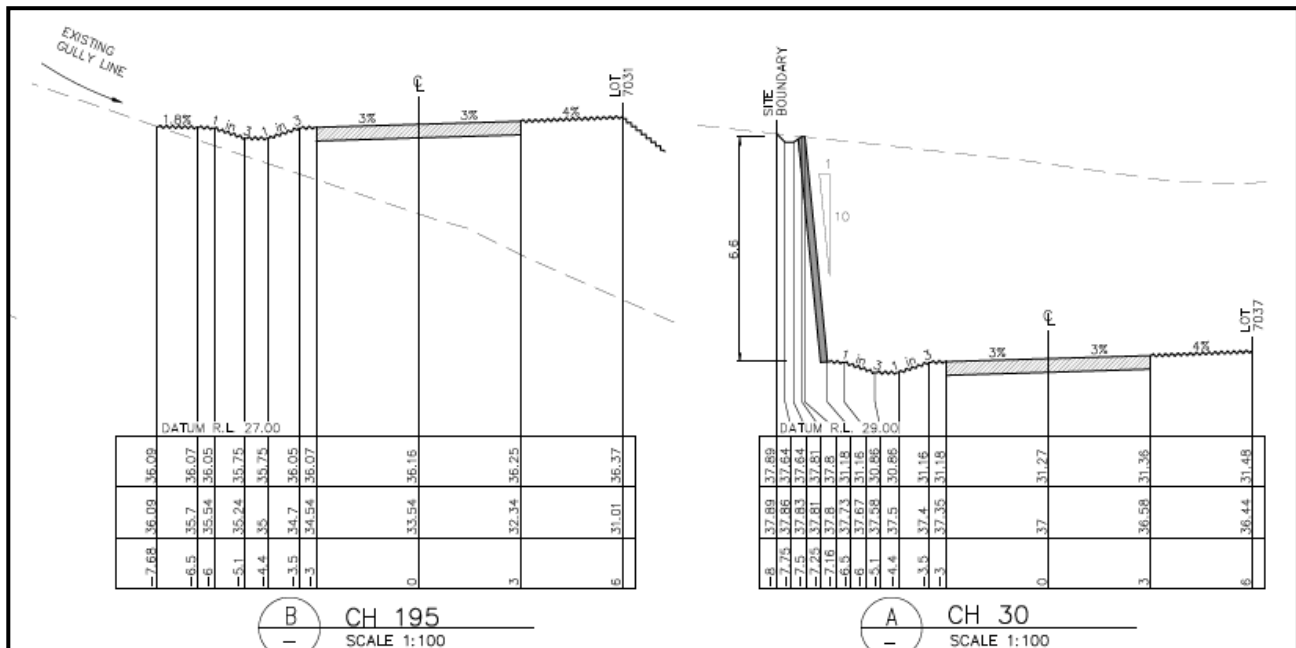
Engineering sections of required extent of cut fill and retaining walls as approved.
